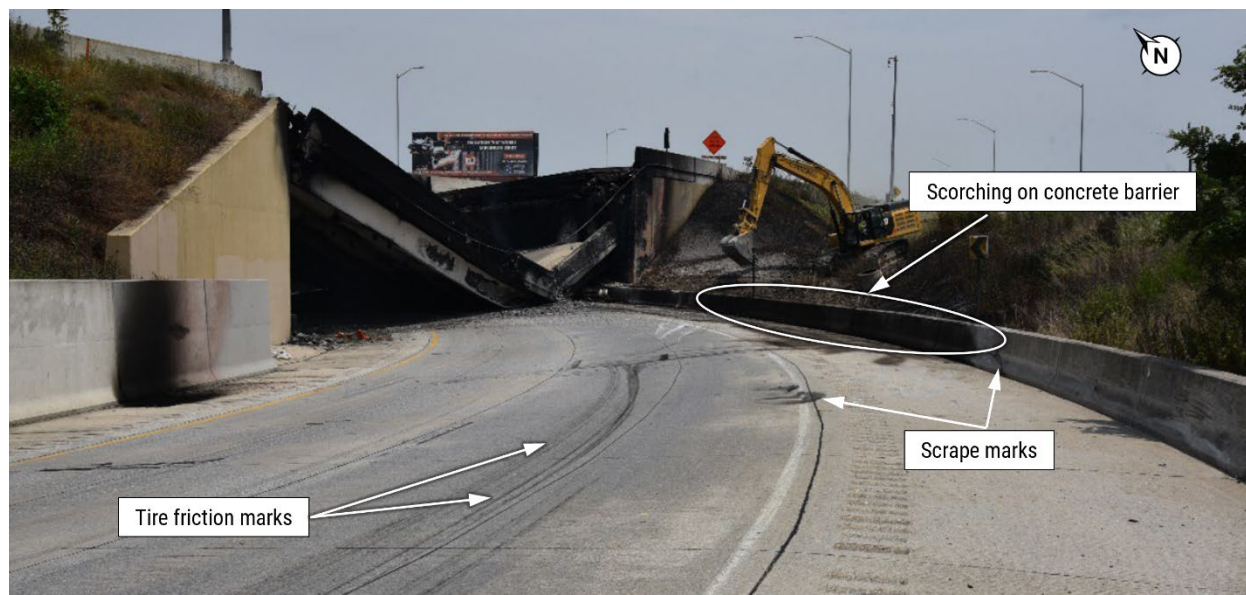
Tire friction marks, scrape marks, and scorching on the Cottman Avenue exit ramp roadway and concrete barrier.
